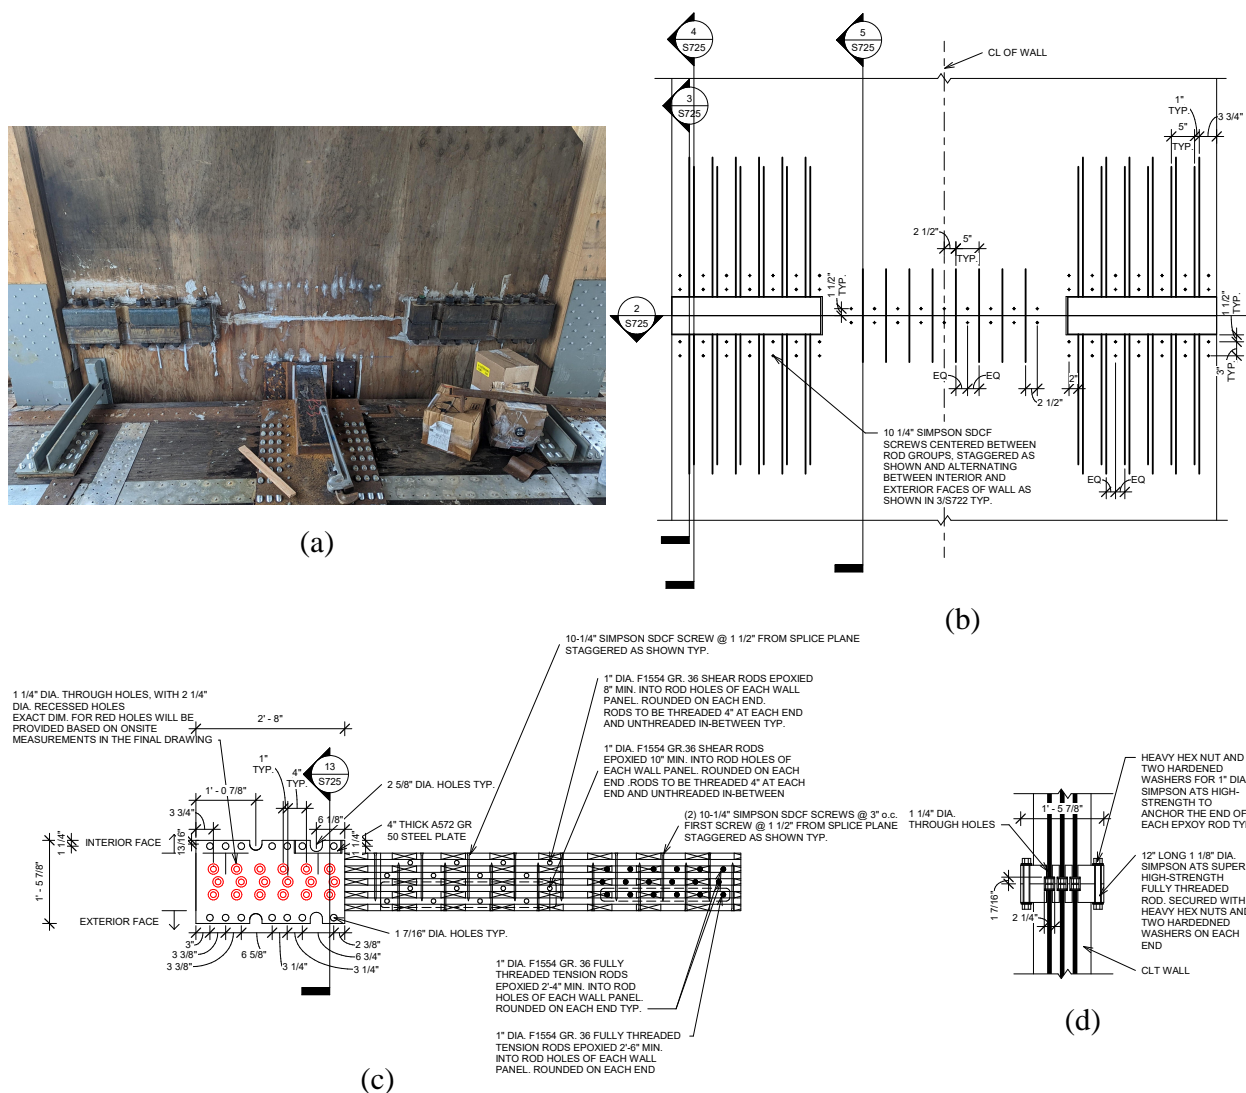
Shear wall horizontal splice (a) photo showing constructed connection (b) elevation view details (c) plan view details, and (d) section view details
